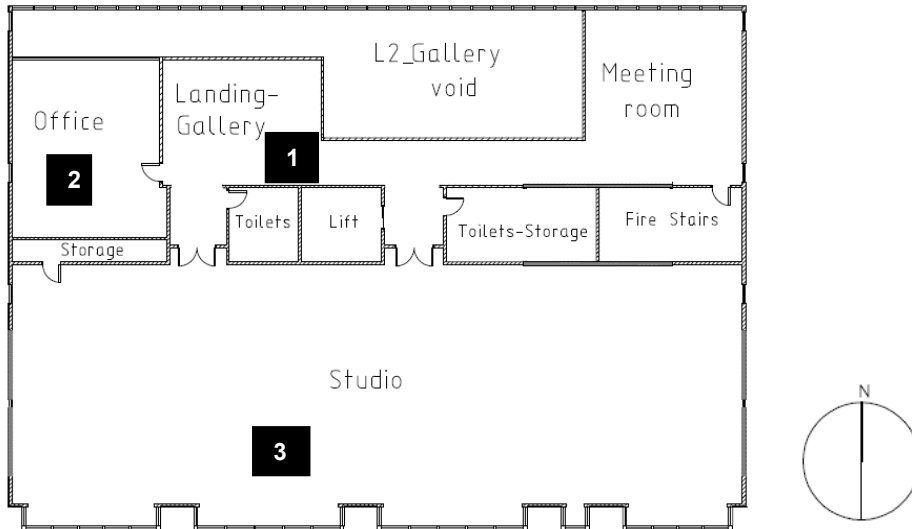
Plan section Level 2 of the Arts building with the specified rooms were PMV has been assessed in this research.
